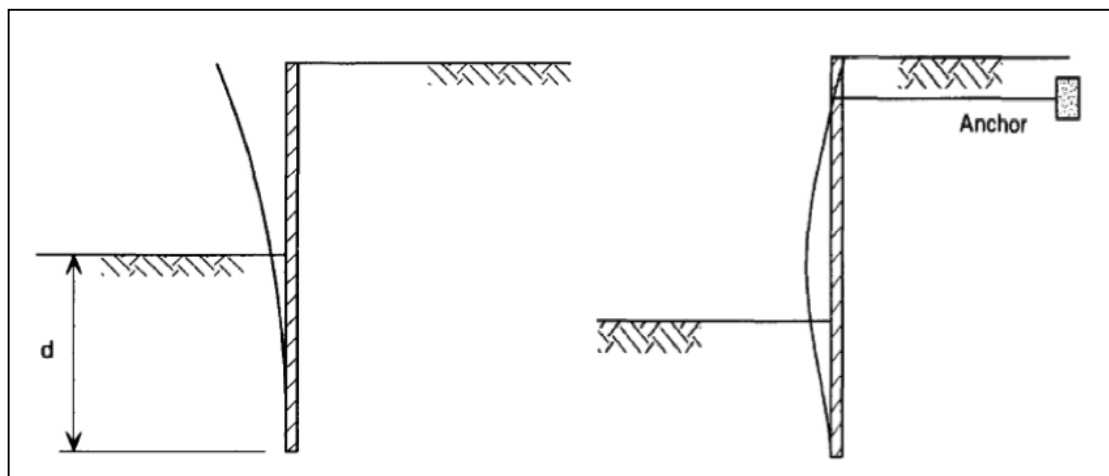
Displacement of Sheet Pile Wall: (a) Cantilever (b) Anchored (Yandzio 1998)
